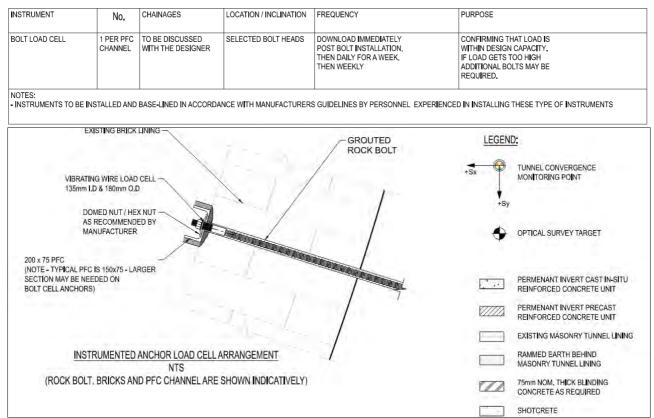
TYPICAL SECTION SHOWING PROPOSED INSTRUMENT MONITORING FOR ROCK BOLTS. (SOURCE: AURECON/VLINE)
